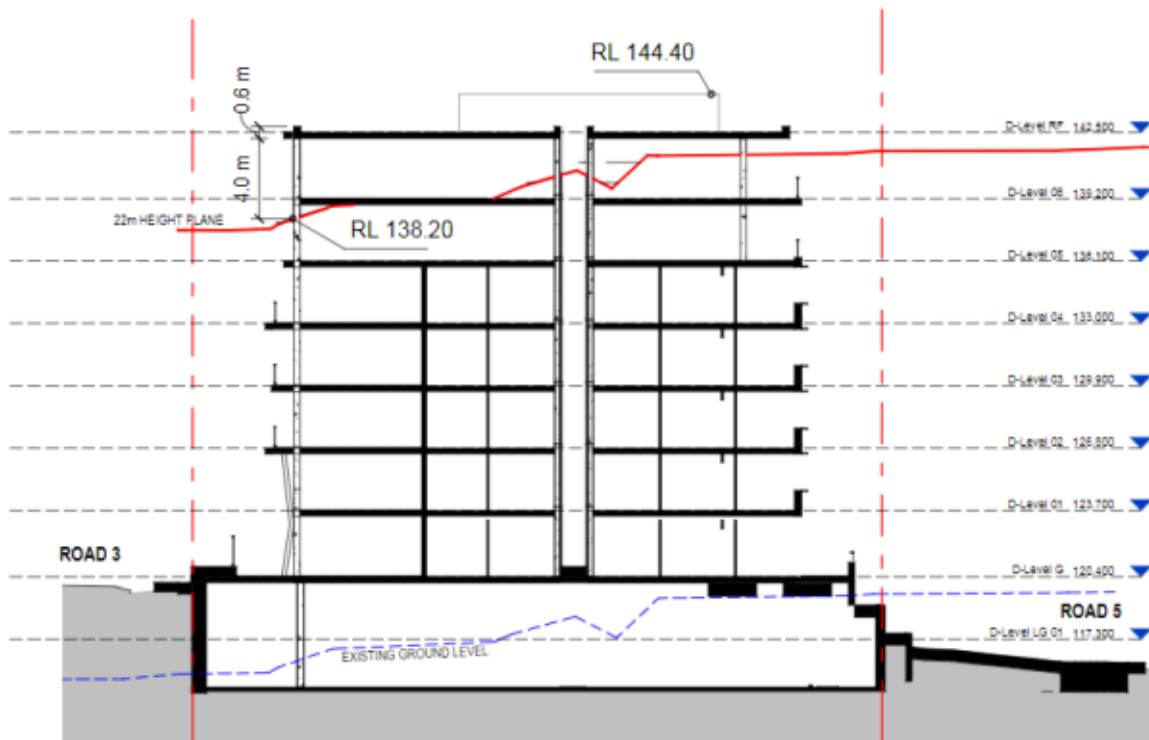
South Section of Building D showing the extent of height contravention (4.6m) (Source: Mirvac Design)
